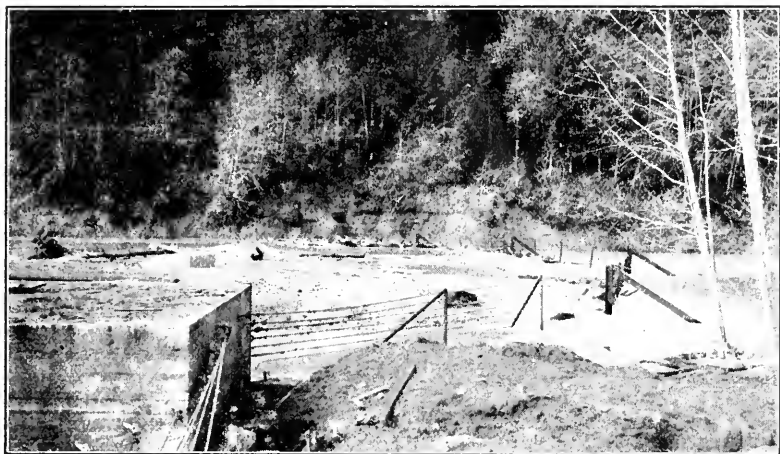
GENERAL VIEW OF FIRST UNIT LOOKING WEST DURING 3-FOOT STAGE OF WATER.
